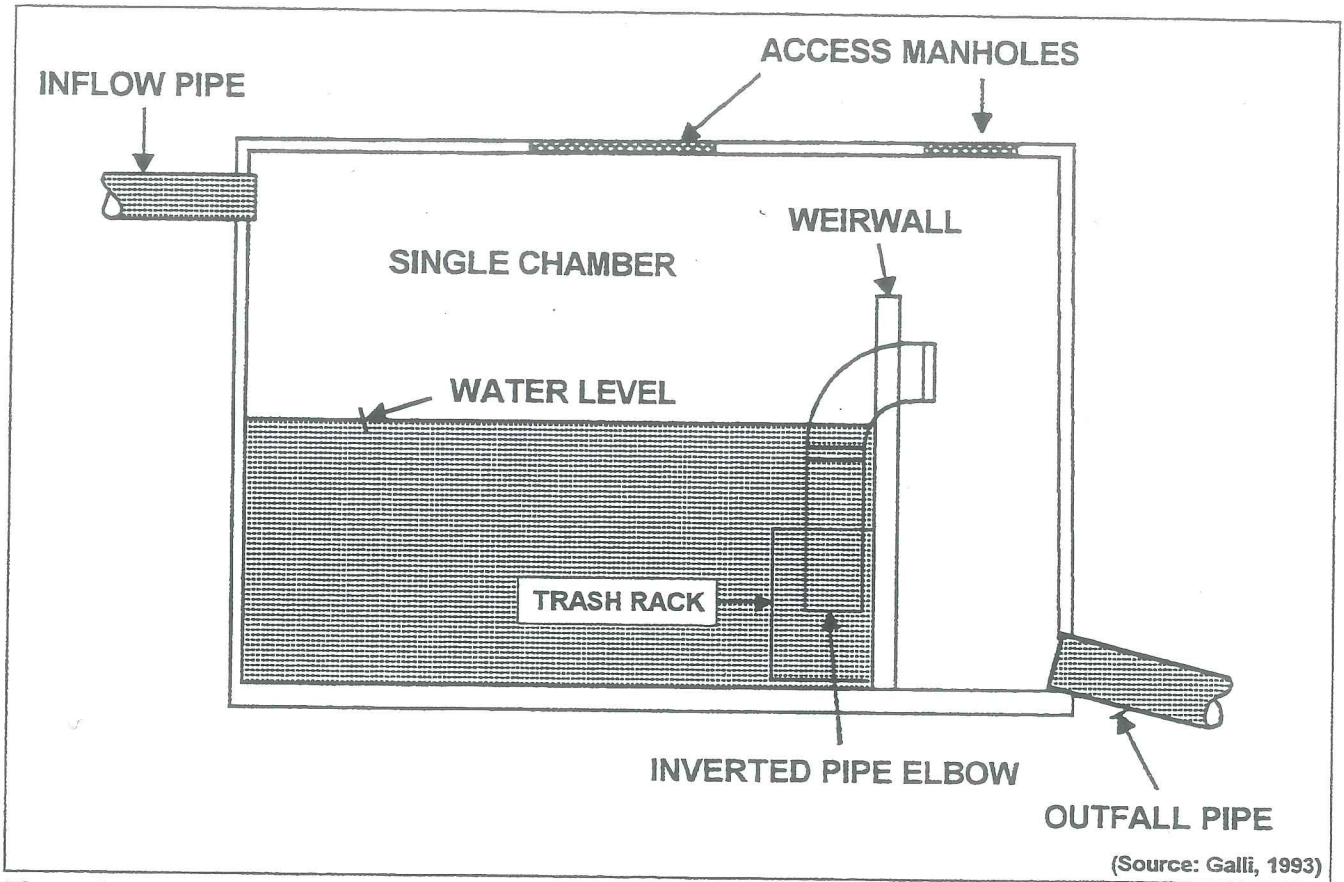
Typical Single Chamber Oil / Grit Separator Structure.
